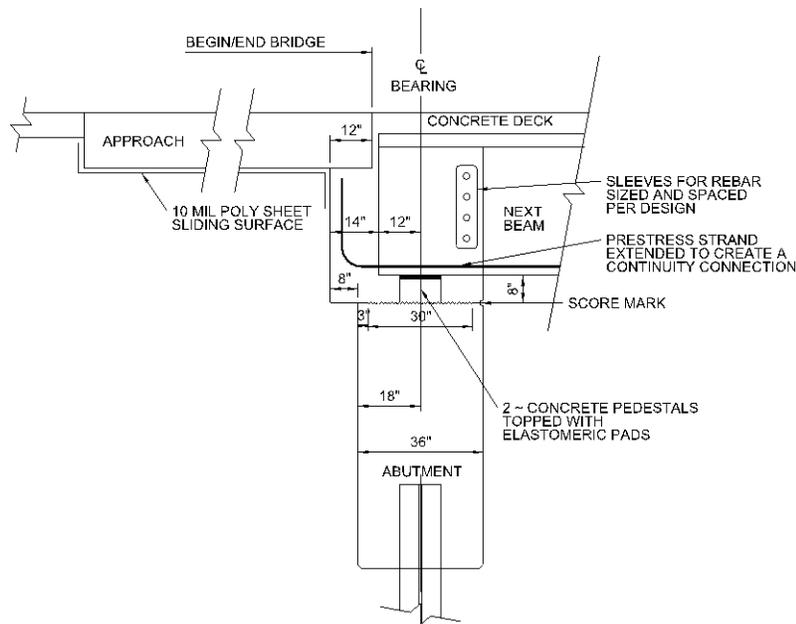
3 North East Extreme Tee (NEXT) Type A Bridge End Detail
